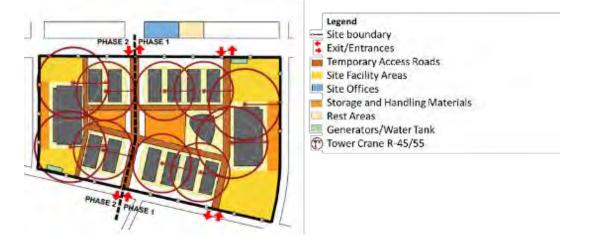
The Layout of the Construction Site and Logistic Plan
